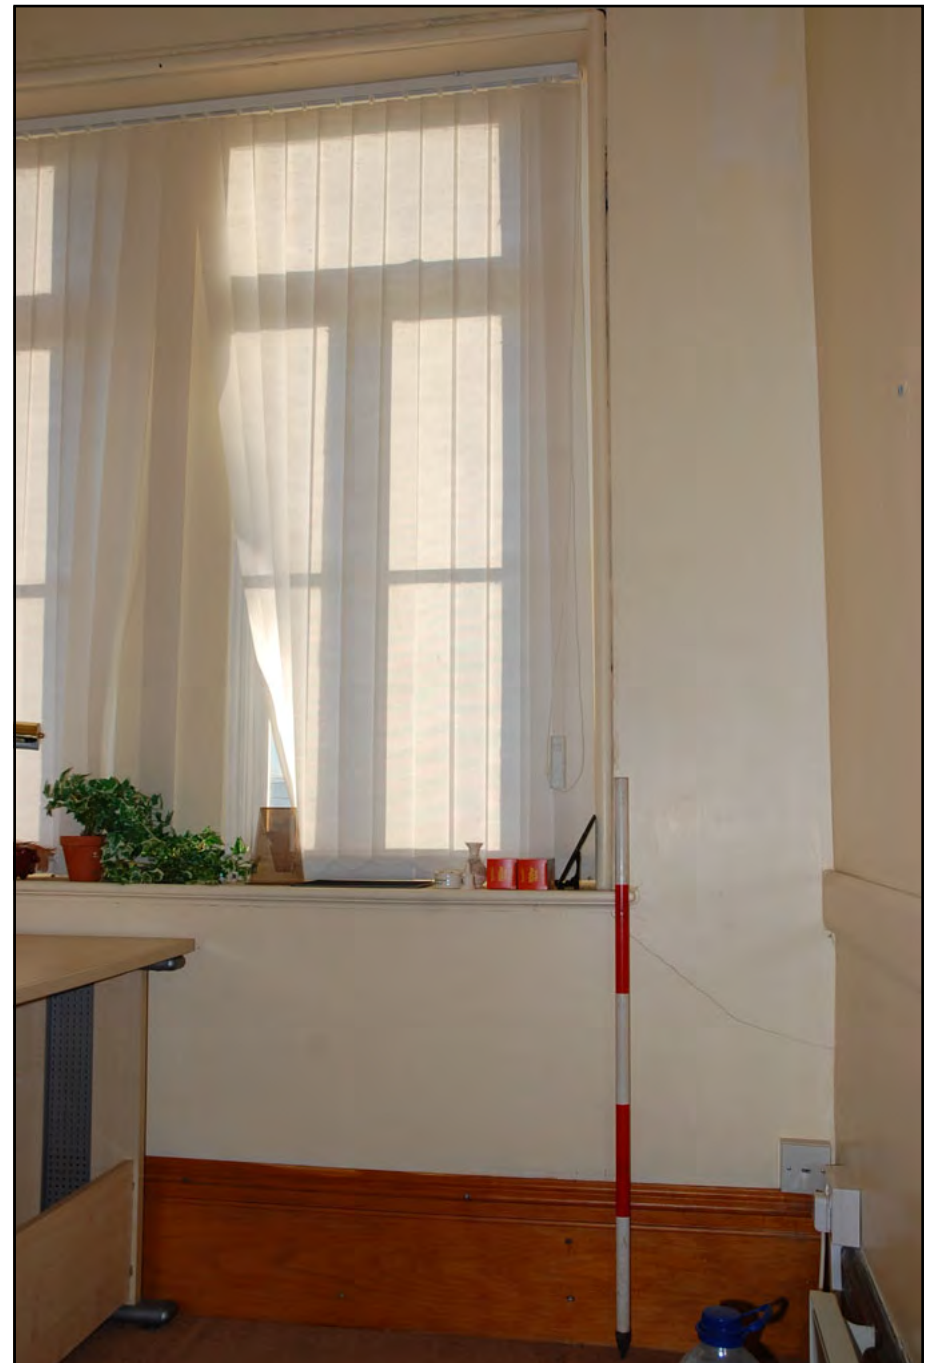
First Floor: Room F02: Window W33 detail and modern skirting fitting
